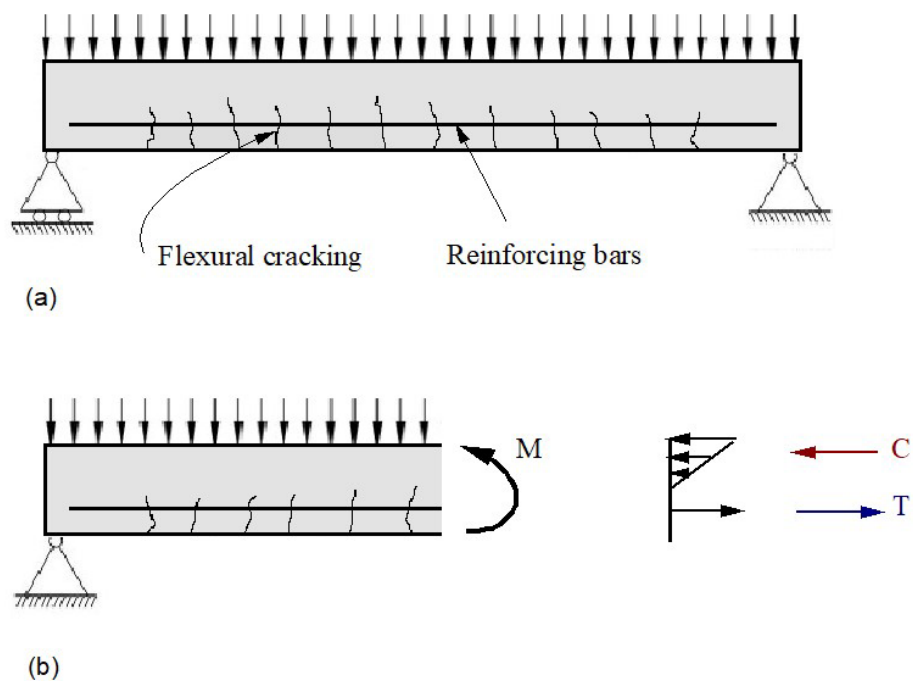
(a) elevation and section of the cracked reinforced concrete beam. (b) free-body diagram, stress distribution and resultant forces of reinforced beam.
